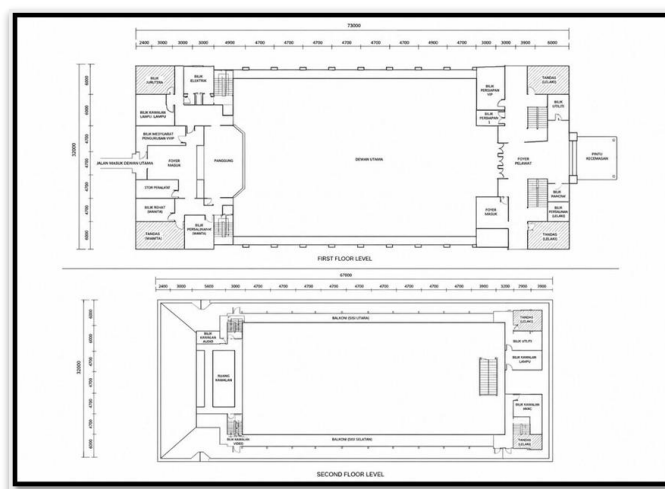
Floor plan of Dewan Jubli Perak and the primary IAQ monitoring point
